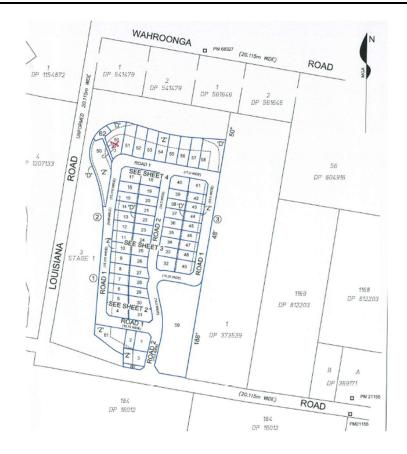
showing site plan for neighbouring consent DA/1419/2017 for residential (R2) subdivision
